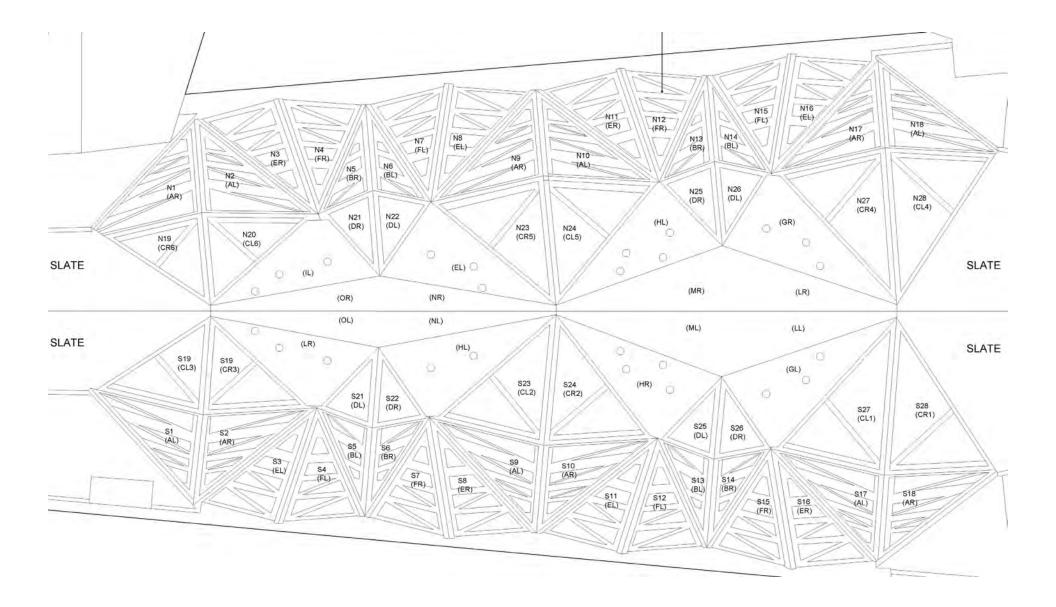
Sanctuary Roof Plan with Pre-cast Panel ID Numbers. Prudon & Partners, LLP, First Presbyterian Church, November 4, 2016, A-200.00.
